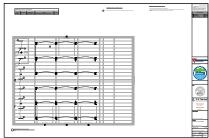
21 E200-FIRST FLOOR Figure 57: 21 E201-MEZZANINE FLOOR REFLECTIVE CEILING PLAN
